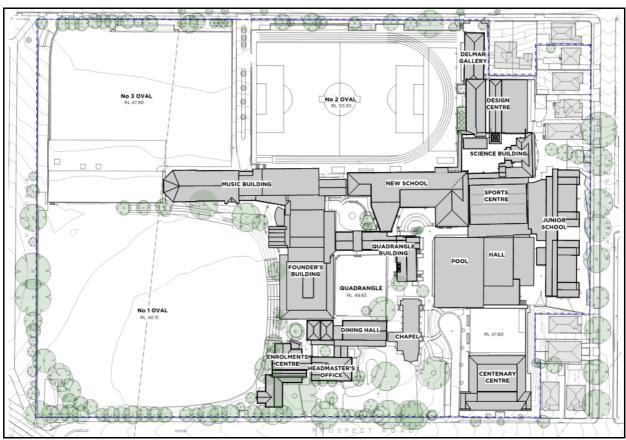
Existing Site Plan (Source: PMDL, 2020)
